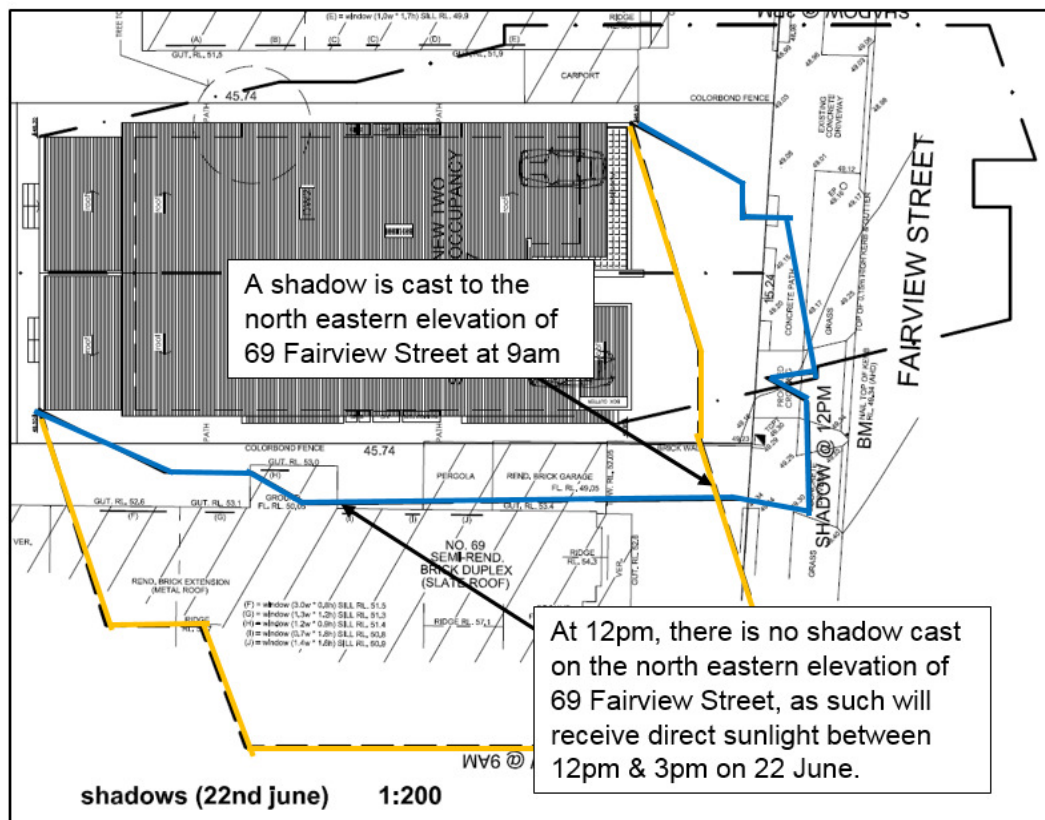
This diagram demonstrates the extent of overshadowing to the adjoining dwelling at 69 Fairview Street.
